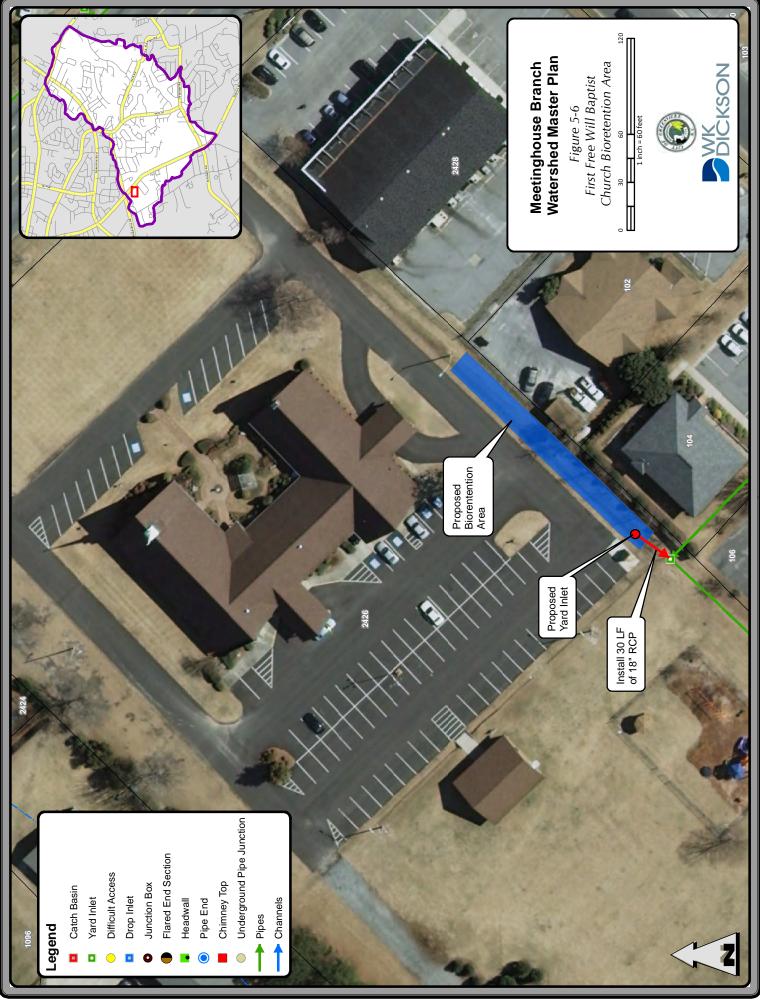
Proposed Location for First Free Will Baptist Church Bioretention Area
